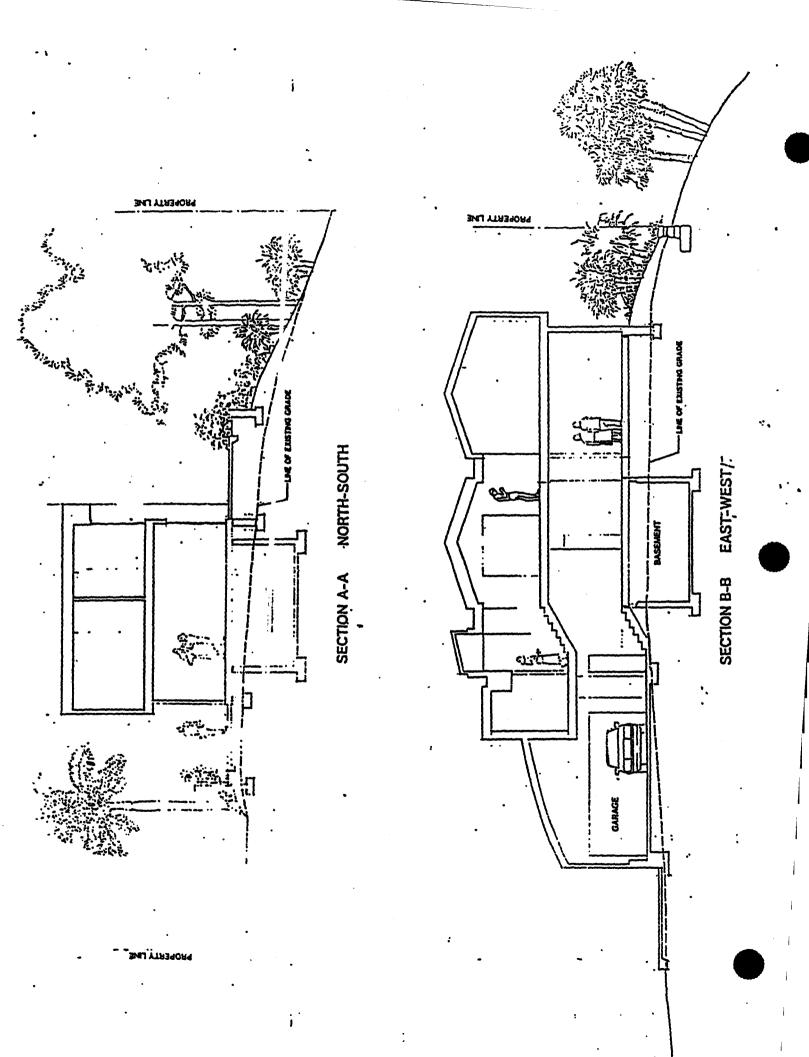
Basement Does Not Count 100% Towards Floor Area
